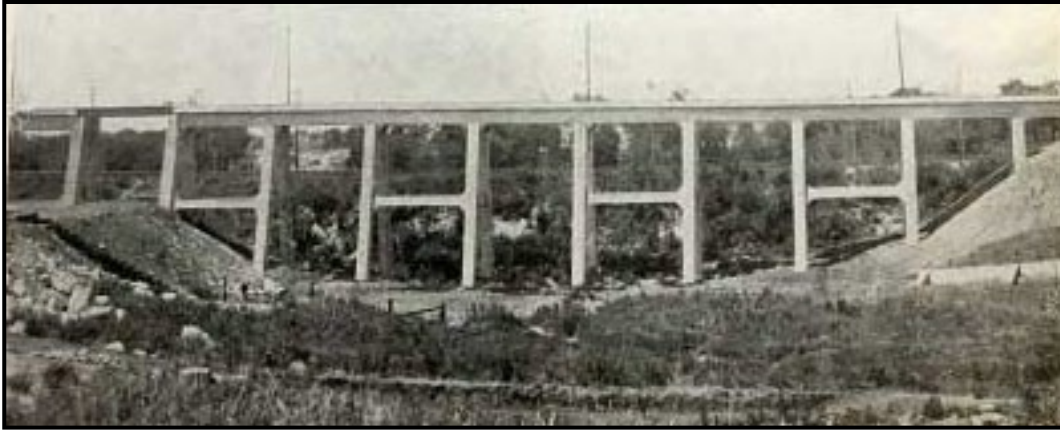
Photo showing the bridge substructure and A-frame bents with stabilizing beams (courtesy of *Traction News, Ft. Worth*, Vol. III, No. 12, June and July 1930, page 6).
